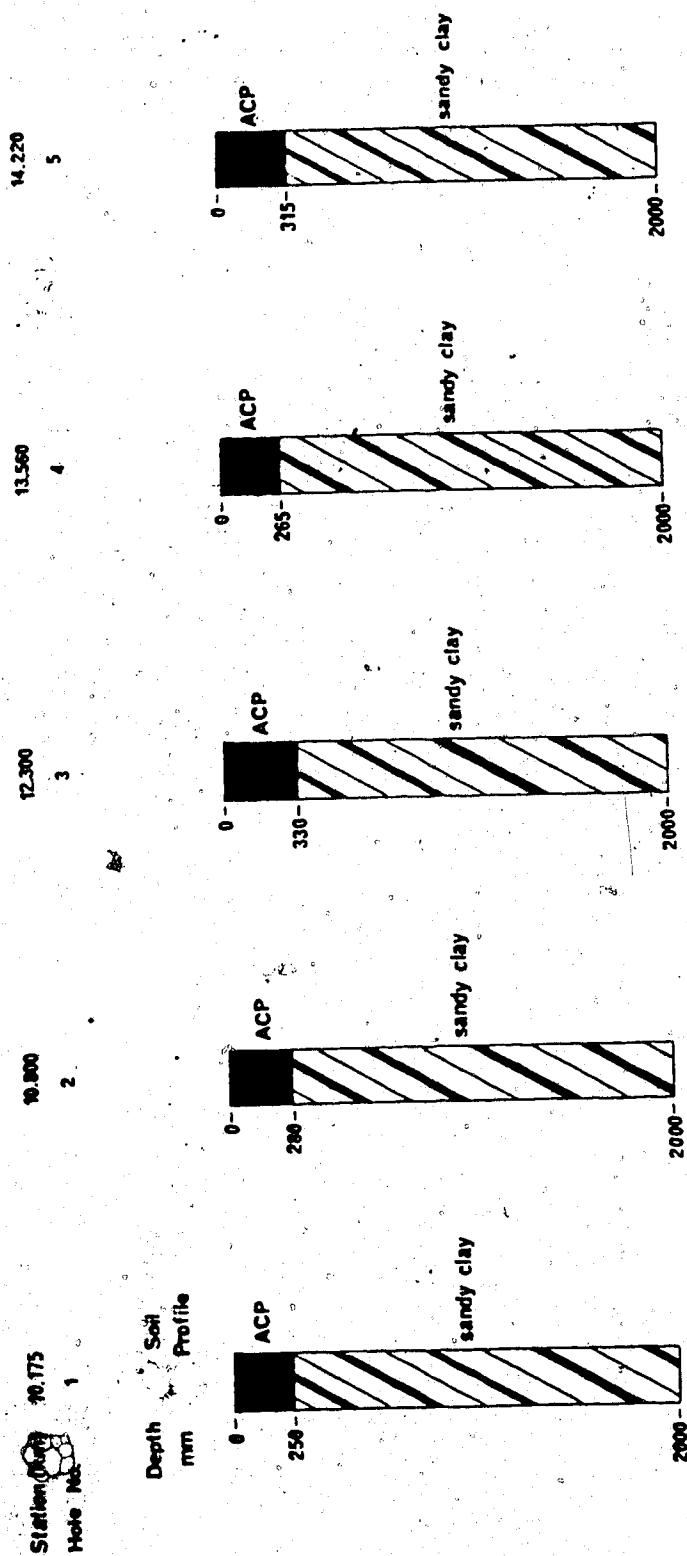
Project SR 845:02 (Non-cracking Section)
